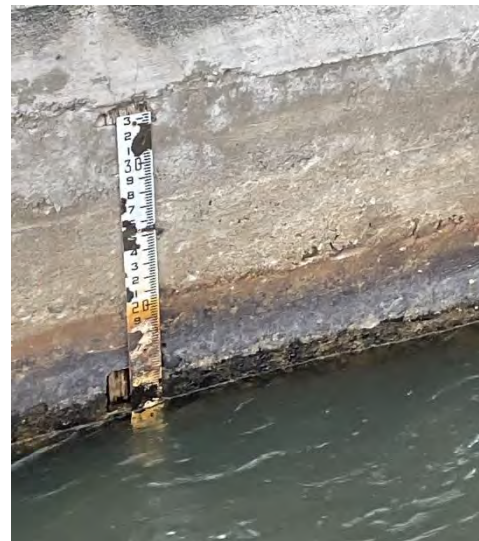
Ventero below Sanchez Outside Staff Gage.
